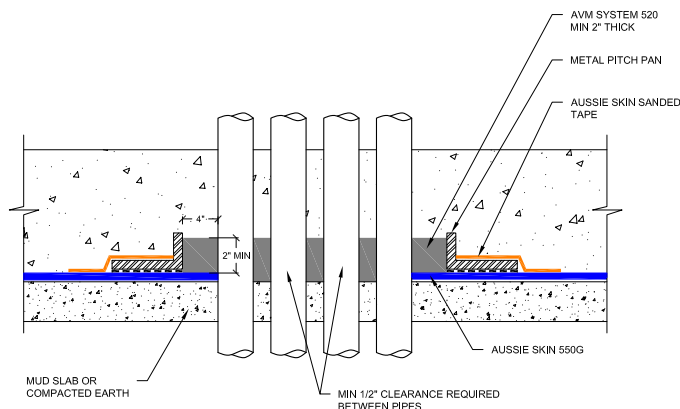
PIPE BANK PITCH PAN DETAIL
